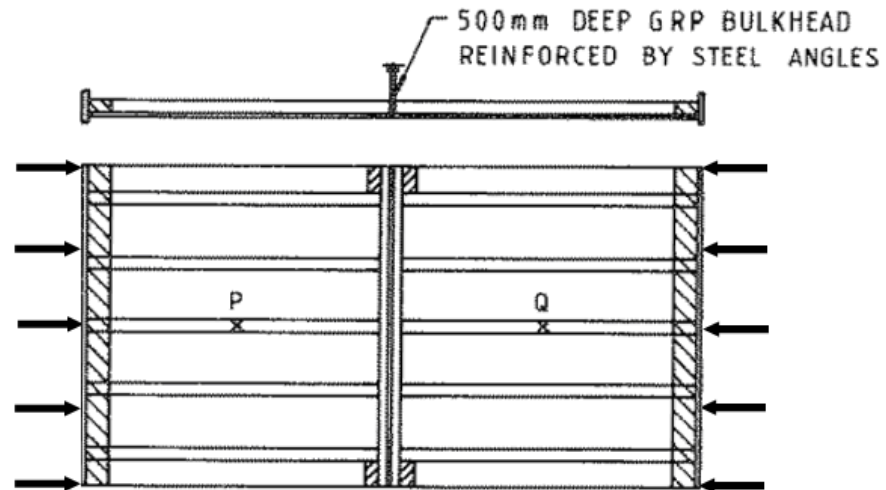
Details of test panel (Smith and Dow, 1985)
